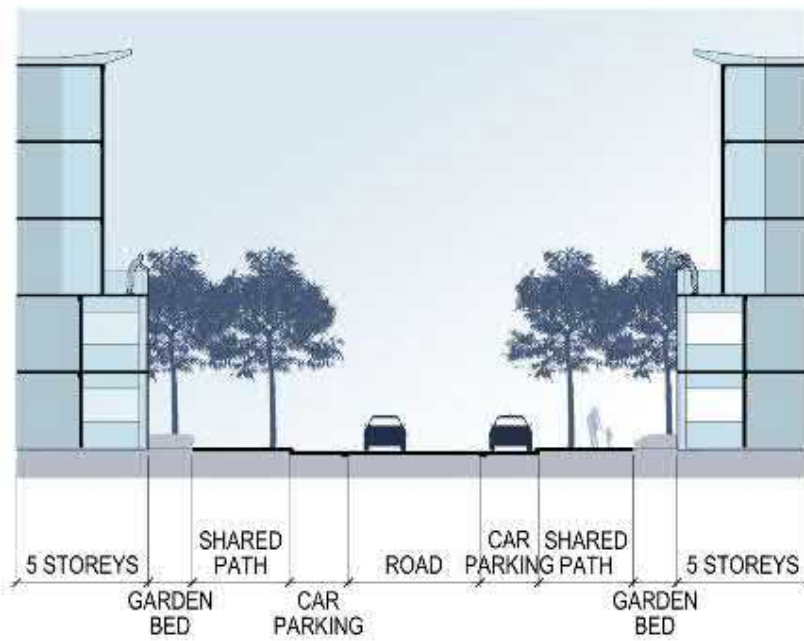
Indicative Daly Street (Main Street) Cross Section (source: EPCAD)
